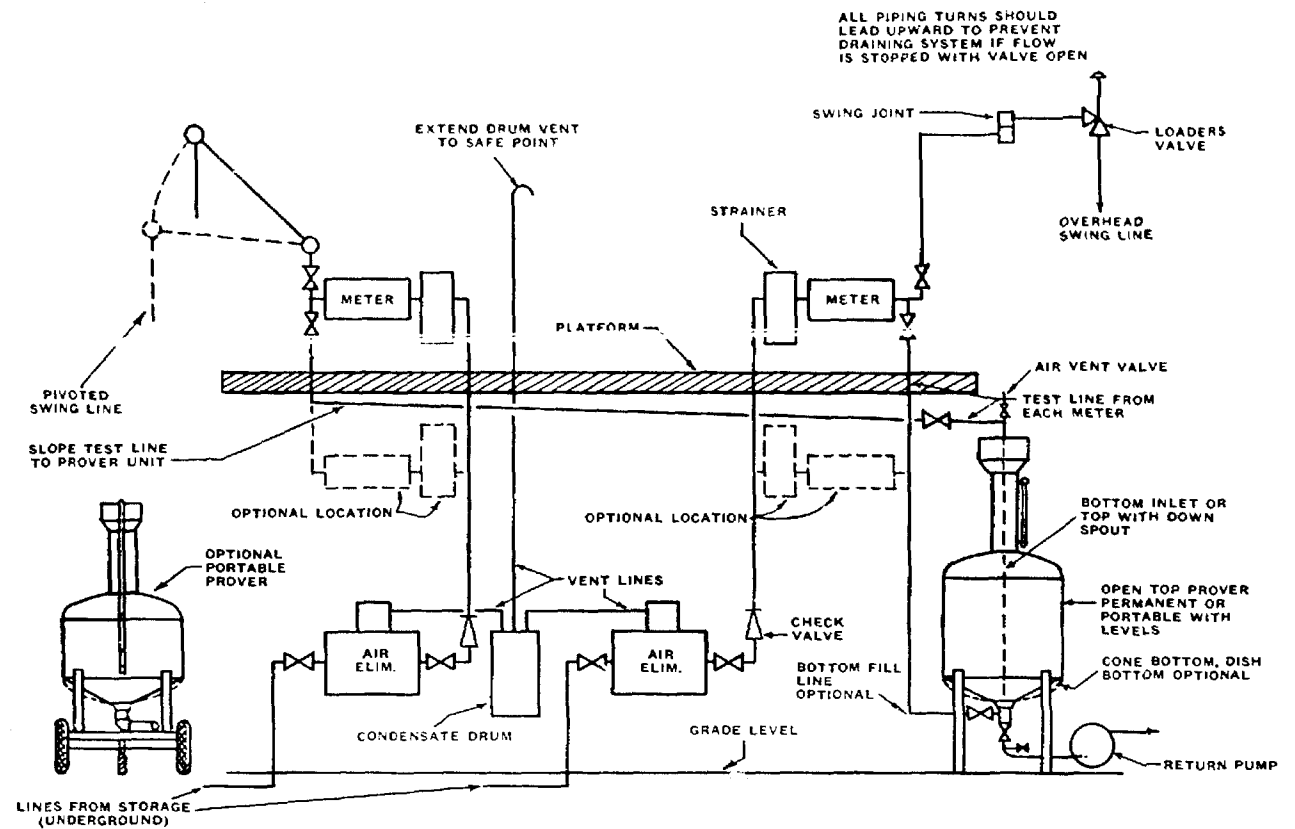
Installation Diagram—Metered Tank Truck Loading Rack.
